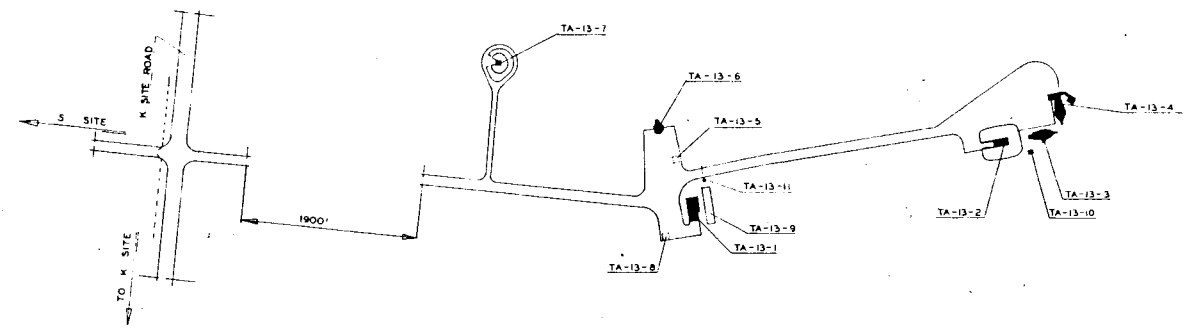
Structure Location Plan for TA-13 - P Site
